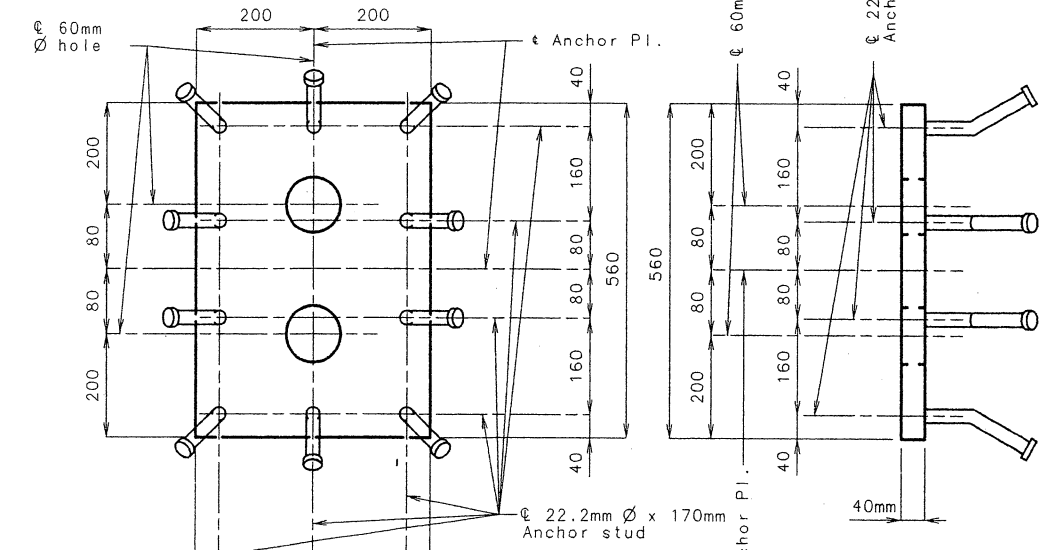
DETAIL OF ANCHOR PLATE FOR INTERIOR GIRDER
